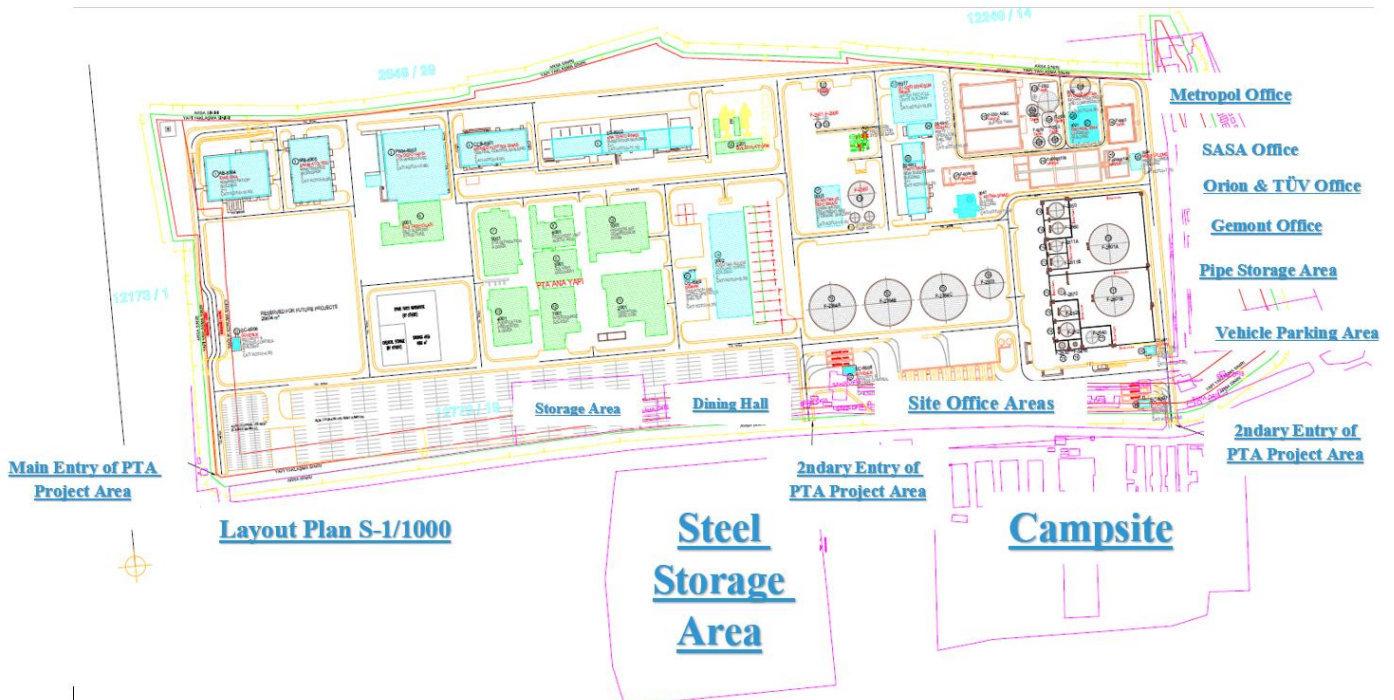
Layout Plan of PTA Production Plant Project Area including temporary campsite, storage areas, office buildings, entry points, dining hall, vehicle parking area etc.
